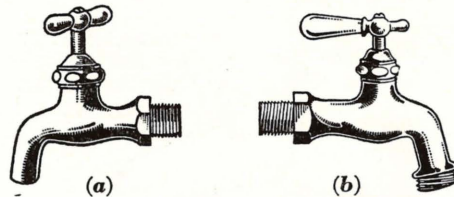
(a) Compression sink bibb, plain nozzle, nickel finished. (b) The hose bibb has the nozzle threaded for attaching hose or water filter
